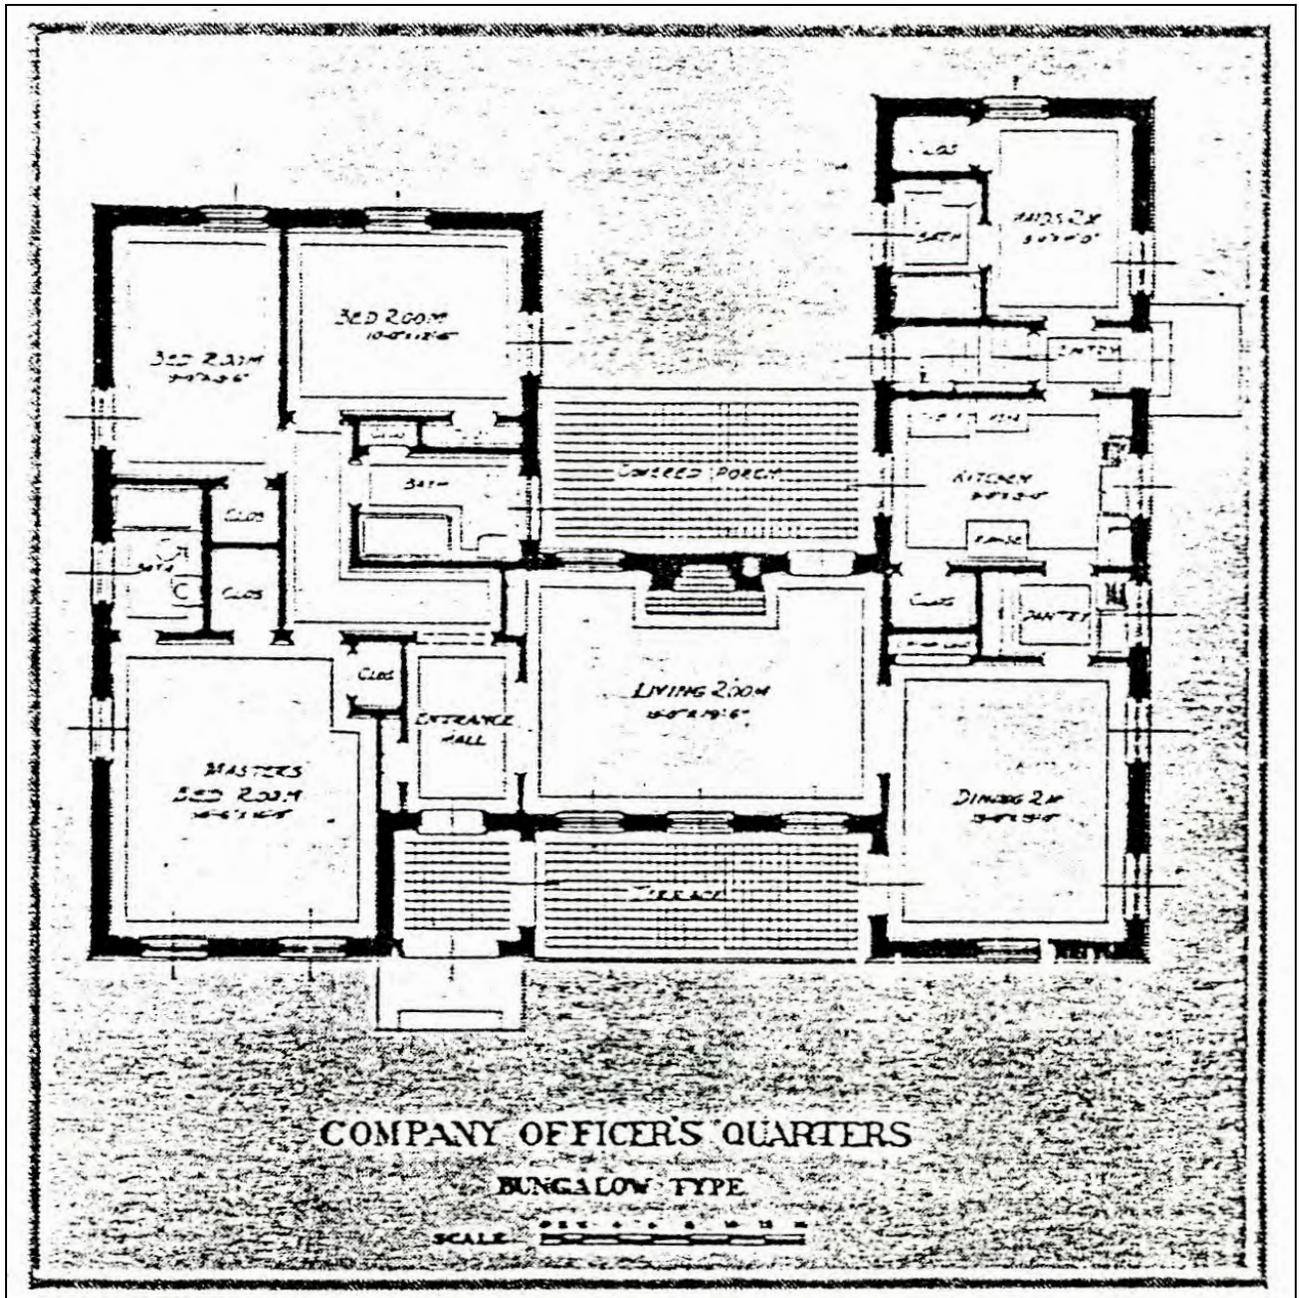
Floor plan for one-story Spanish Colonial Revival style bungalow (Source: Chambers 1928:25).
